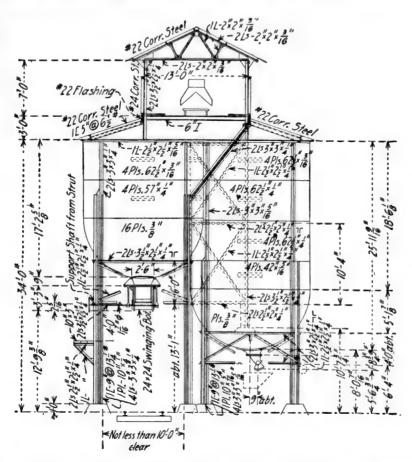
ELEVATION CIRCULAR STEEL ORE BIN FOR OLD DOMINION COPPER MINING CO.
